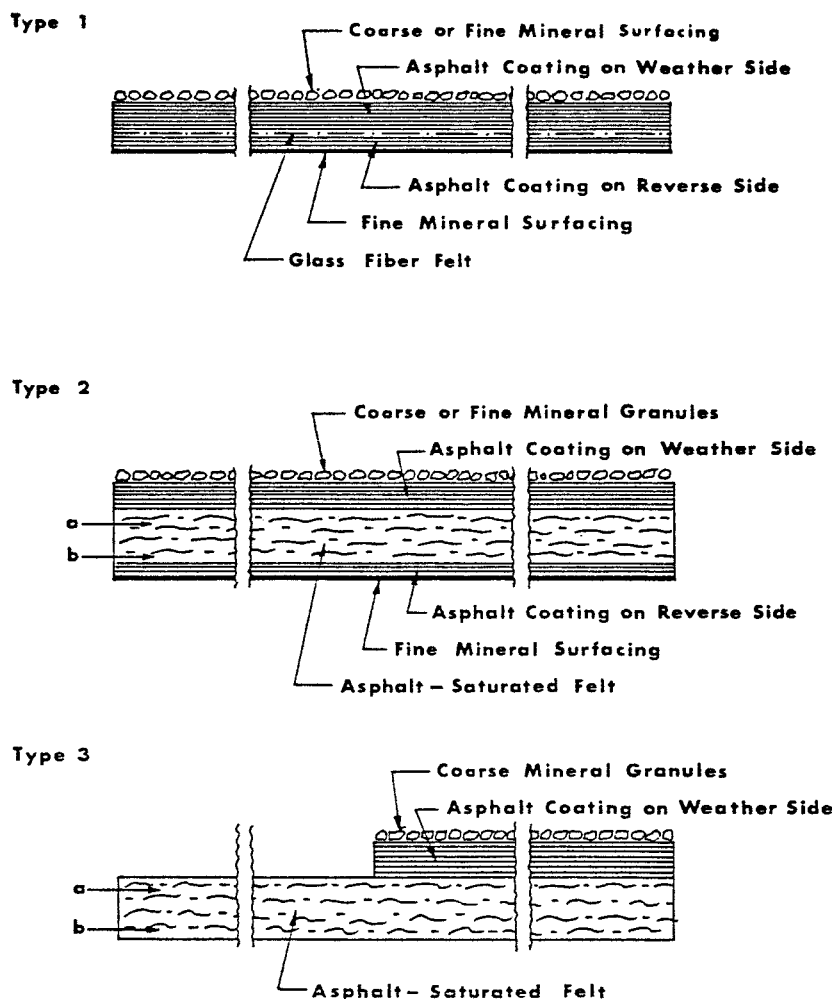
Types of Asphalt-Coated Roll Roofing and Shingles
